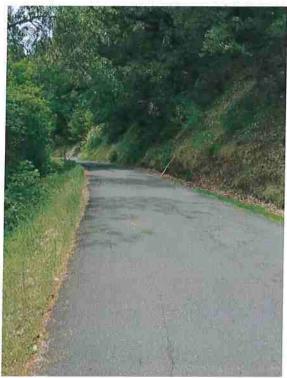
BMR PM 1.0, 15-ft. wide asphalt surface with longitudinal slope of 8% and no shoulder.
